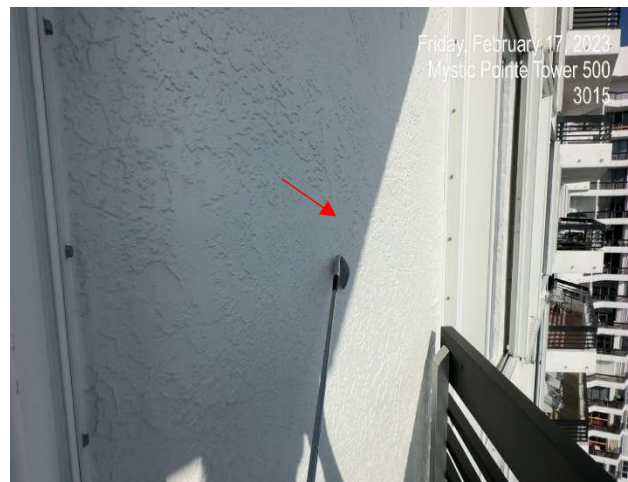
c.2 – Stucco with hollow sound at balcony wall (Unit 3015)
